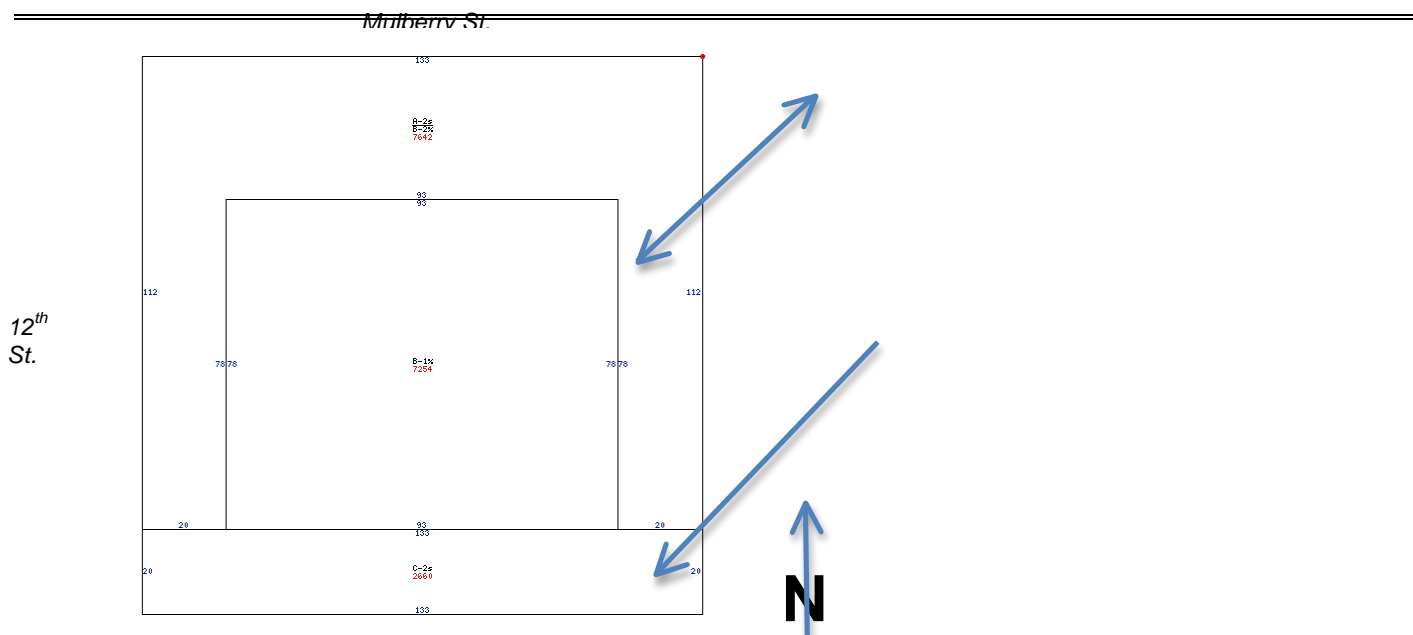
Building footprint showing original building (double arrow) to the north and narrow southern addition (single arrow). The inverted U-shape on the original building marks the location of the second-story offices on perimeter walls ringing the largely two-story rear workroom (some storage space exists on the second floor above the workroom). (PCAO)
